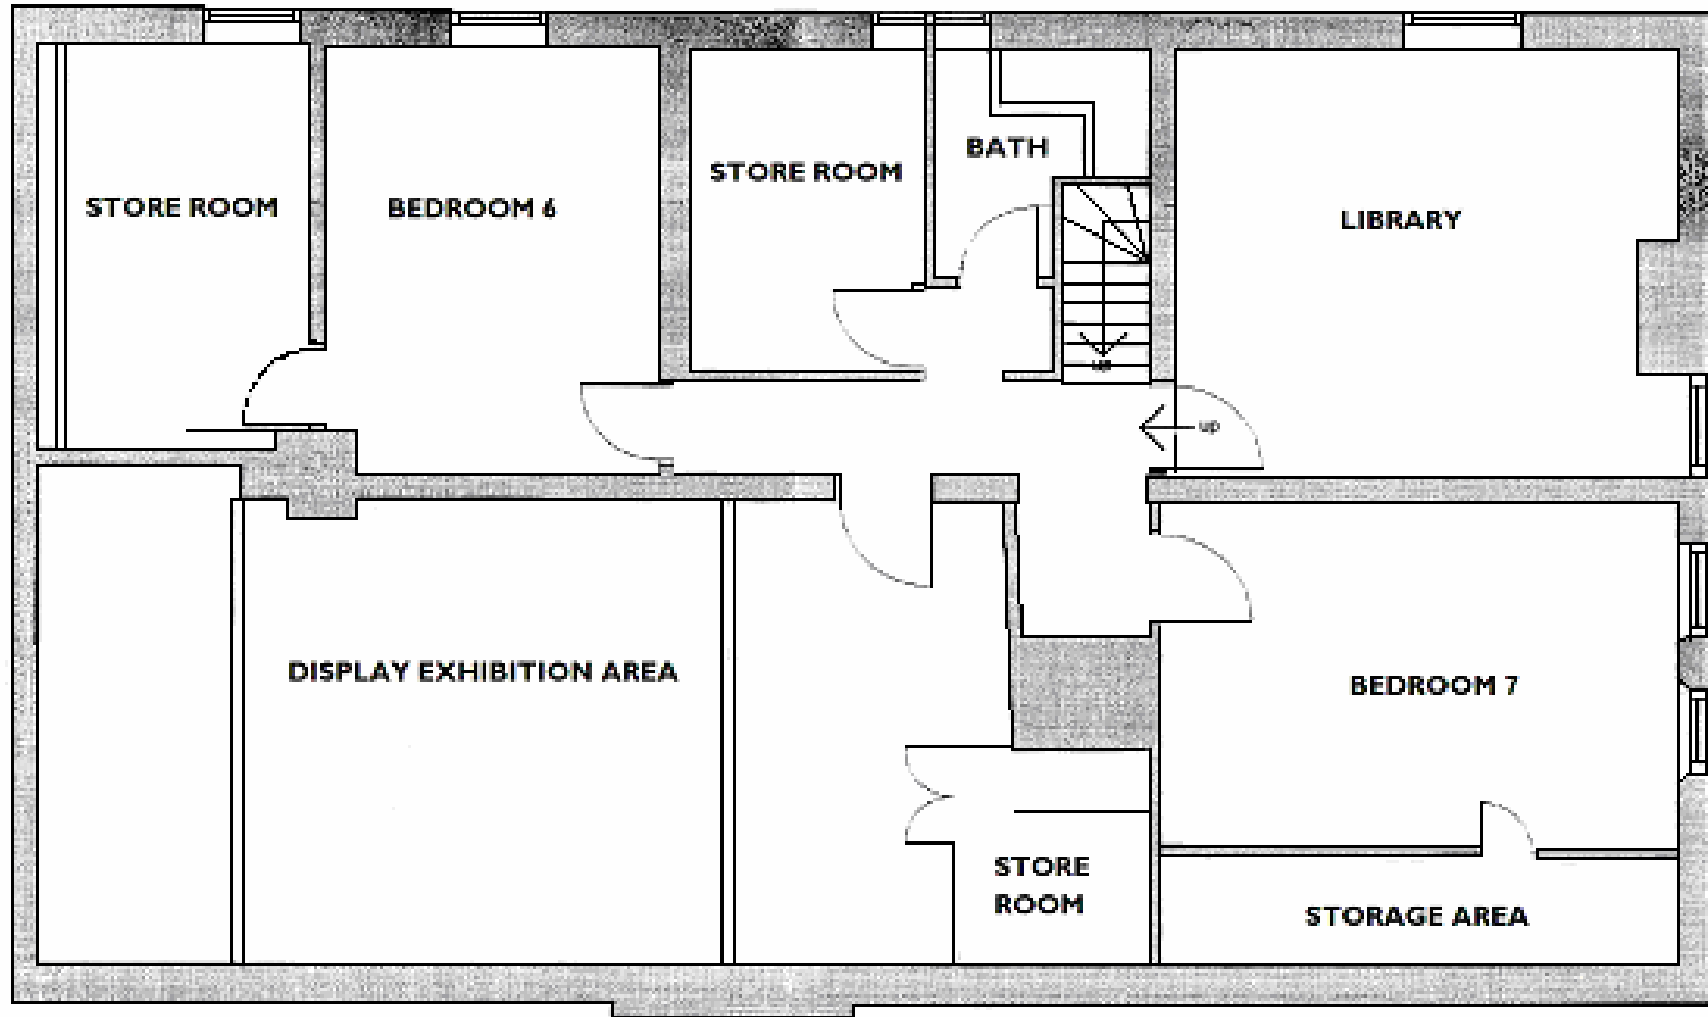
The Old Rectory; Second-floor plan (David Glew Architect & Surveyor)
